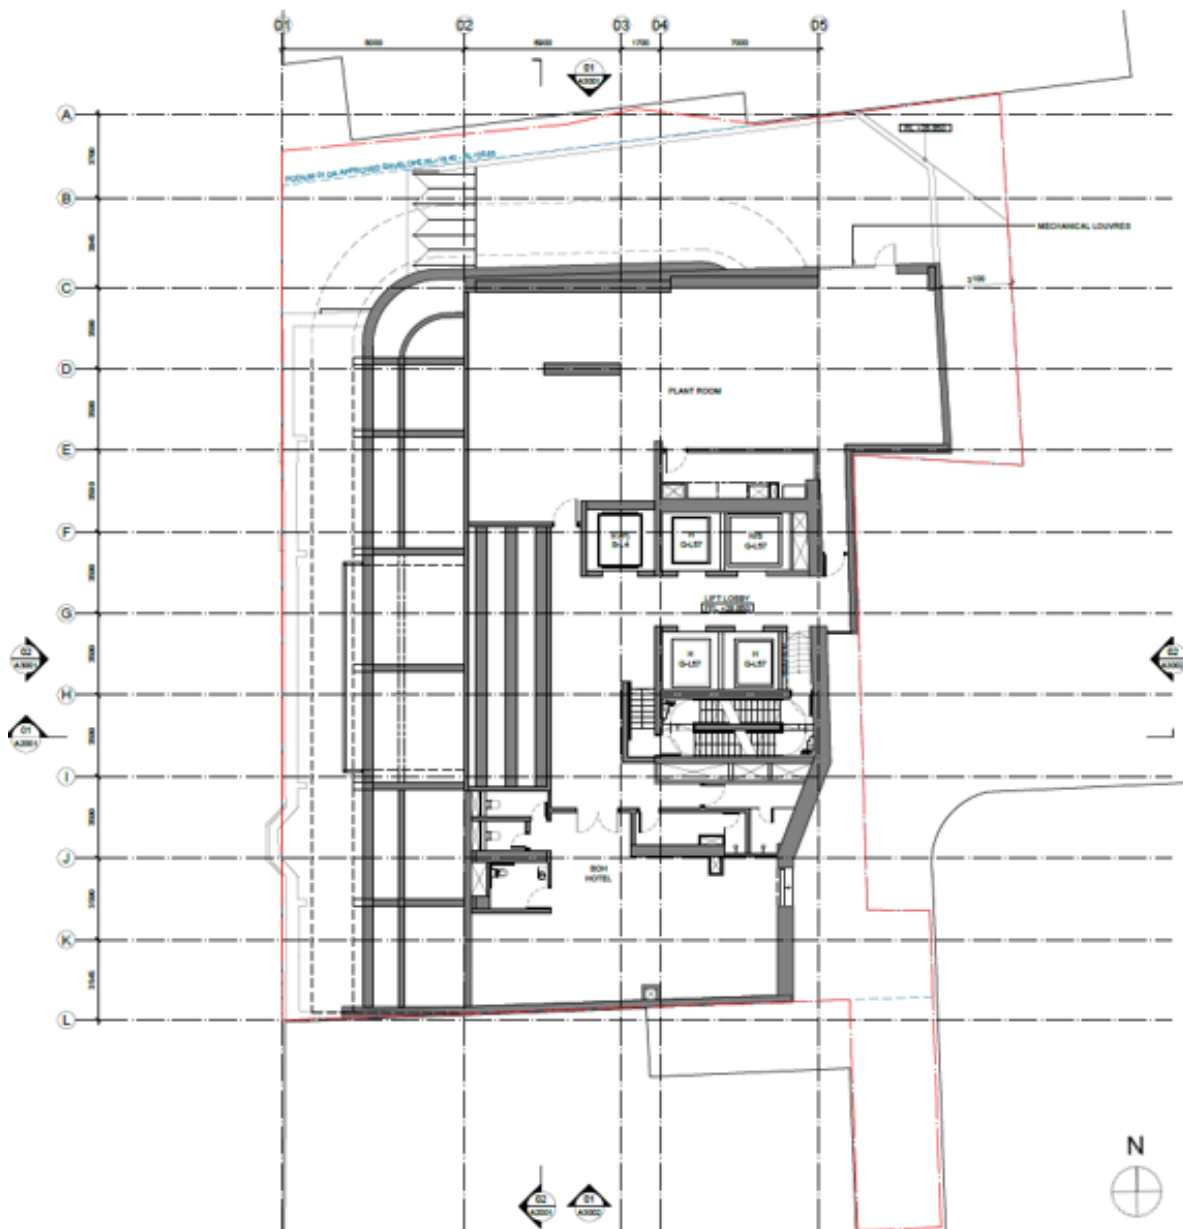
| Proposed ground floor plan (Source: RtS architectural plans)
